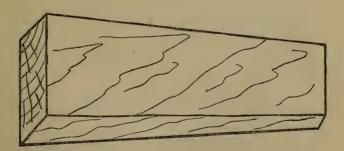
Illustrates a tapering wood block used in making hollow concrete walls.
